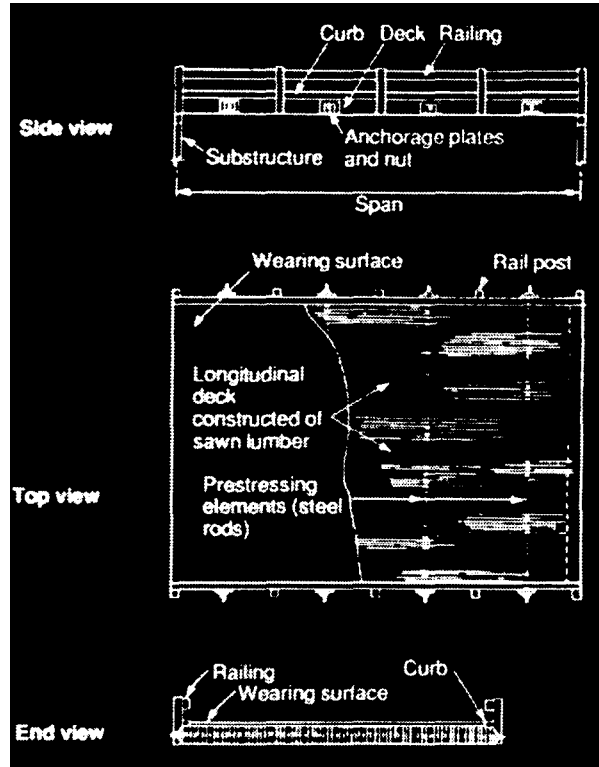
Schematic of a Longitudinal Stress-Laminated Timber Bridge
